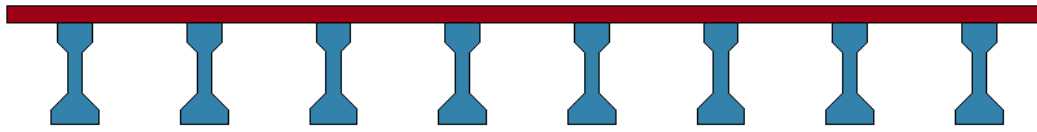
Cross-Sectional View of Archetype 3 Bridge Model
